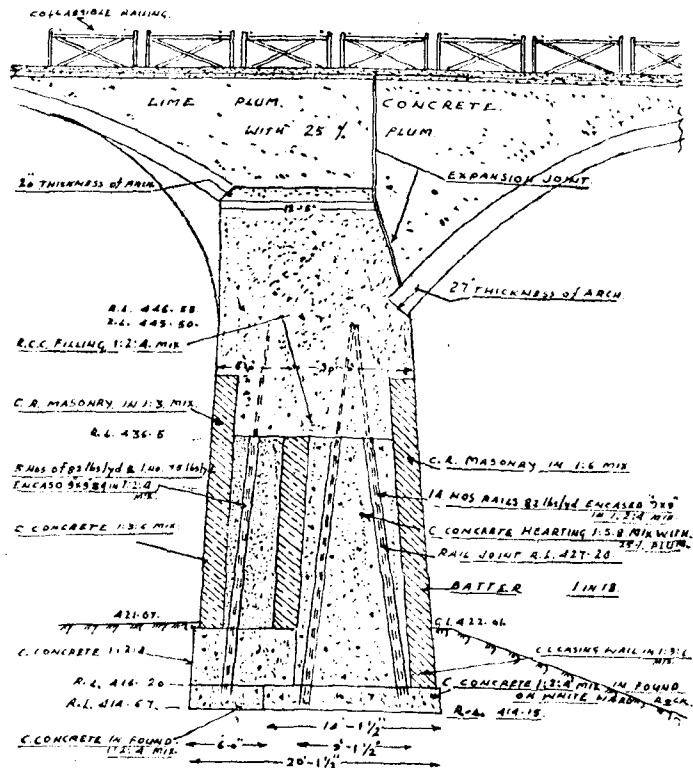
Details of abutment pier on Narmada bridge at Mortakka
